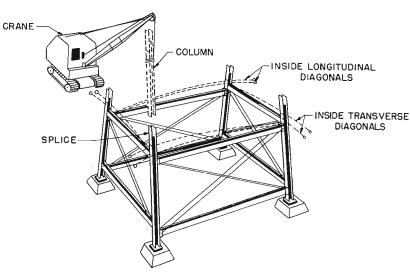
Crawler-mounted crane erecting steel tower from ground.
